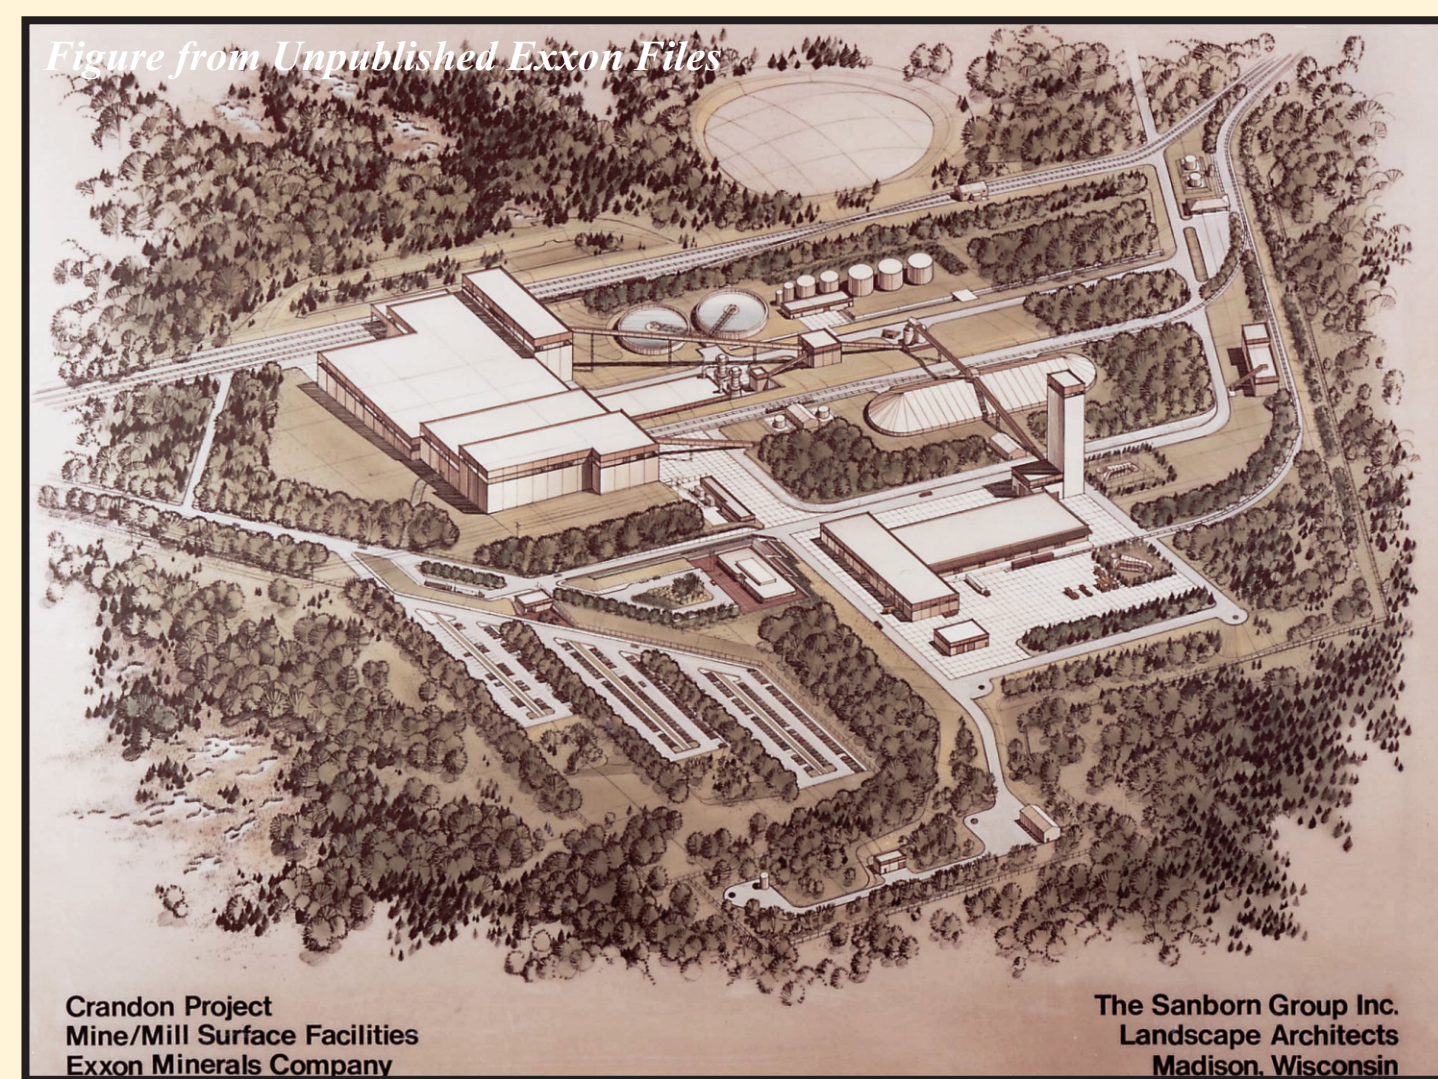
Proposed mine plan and infrastructure at the Crandon Deposit.
